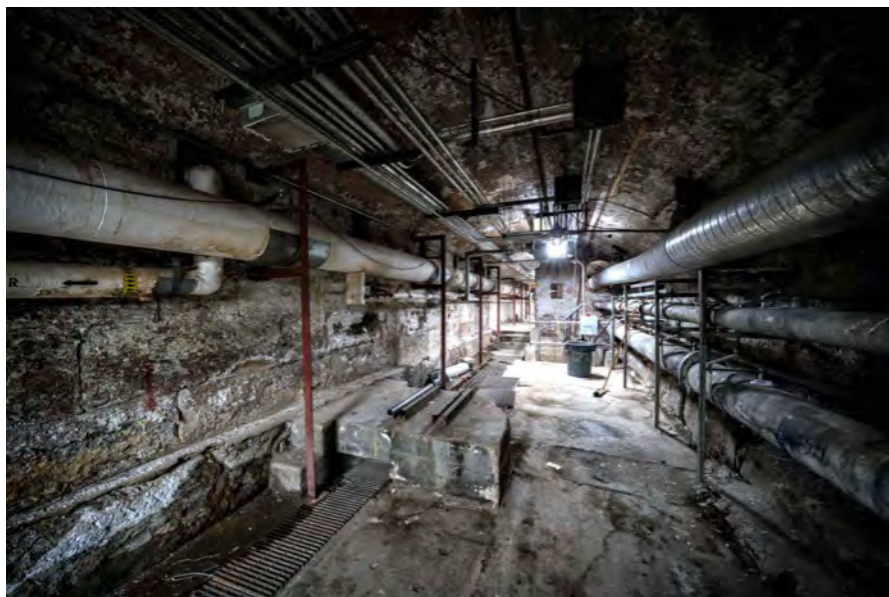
Main Penitentiary Building interior, basement under Housing Unit D, looking north, showing the distribution of mechanical, electrical and plumbing services, stone walls and floor, and arched brick ceiling
